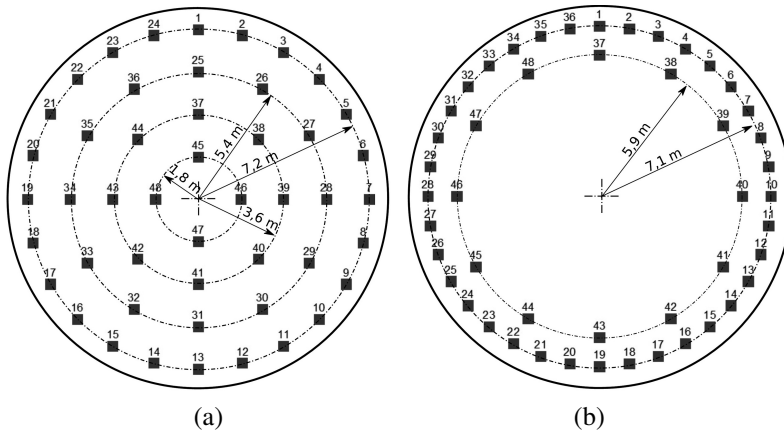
Pile arrangement in a foundation: a) case 1, b) case 2
